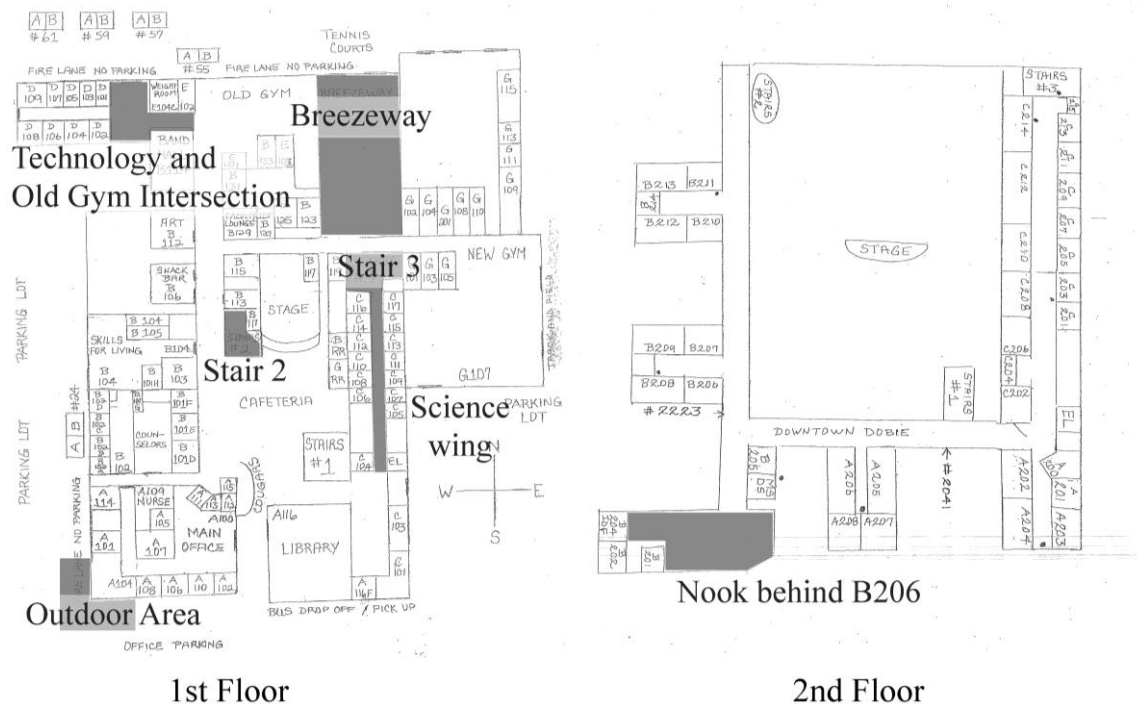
Annotated Floor Plan of Dobie Junior High School
